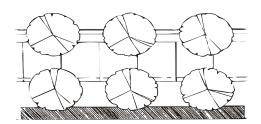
of 4 - Street Elevation drawing on street where a double row of trees is specified.
